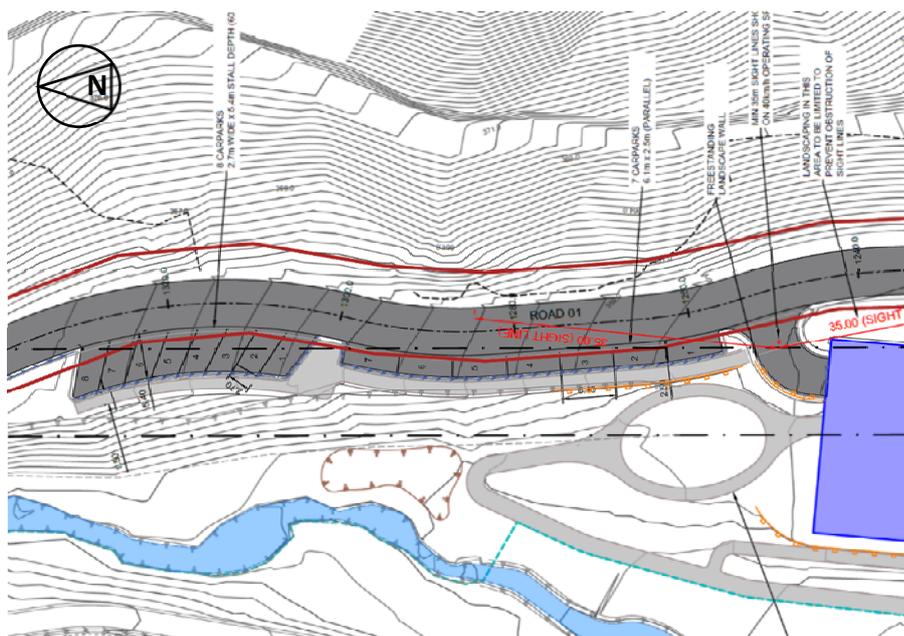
Kerbside Parking North of Building E (Extract from Paterson Pitts Drawing)
